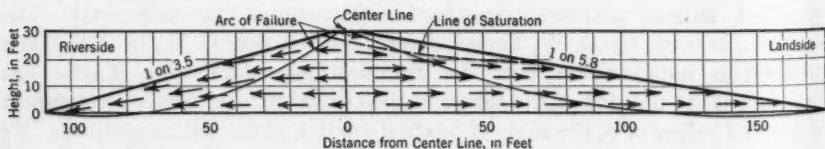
DIRECTION OF SEEPAGE FORCES THROUGHOUT CROSS-SECTION, SUDDEN DRAW-DOWN CASE
